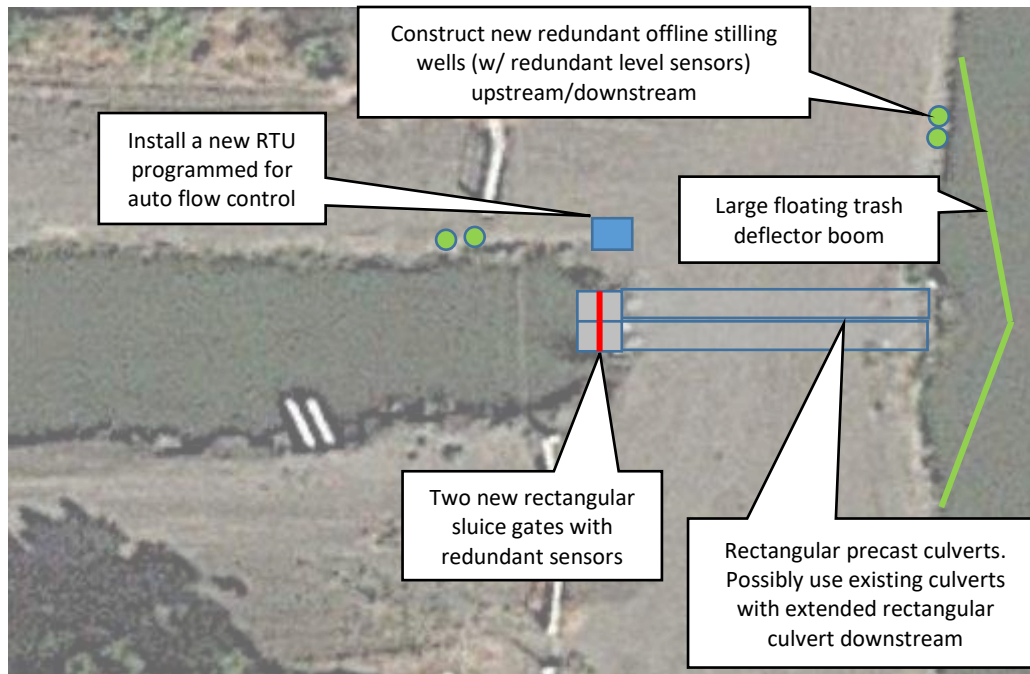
Conceptual design for a new flow control structure at Branch 3 Canal headworks, plan view
